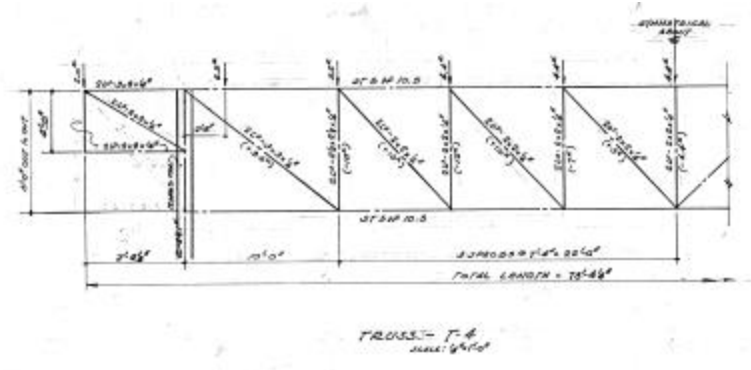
Truss T-4 Profile from CFAC Roof 4.
